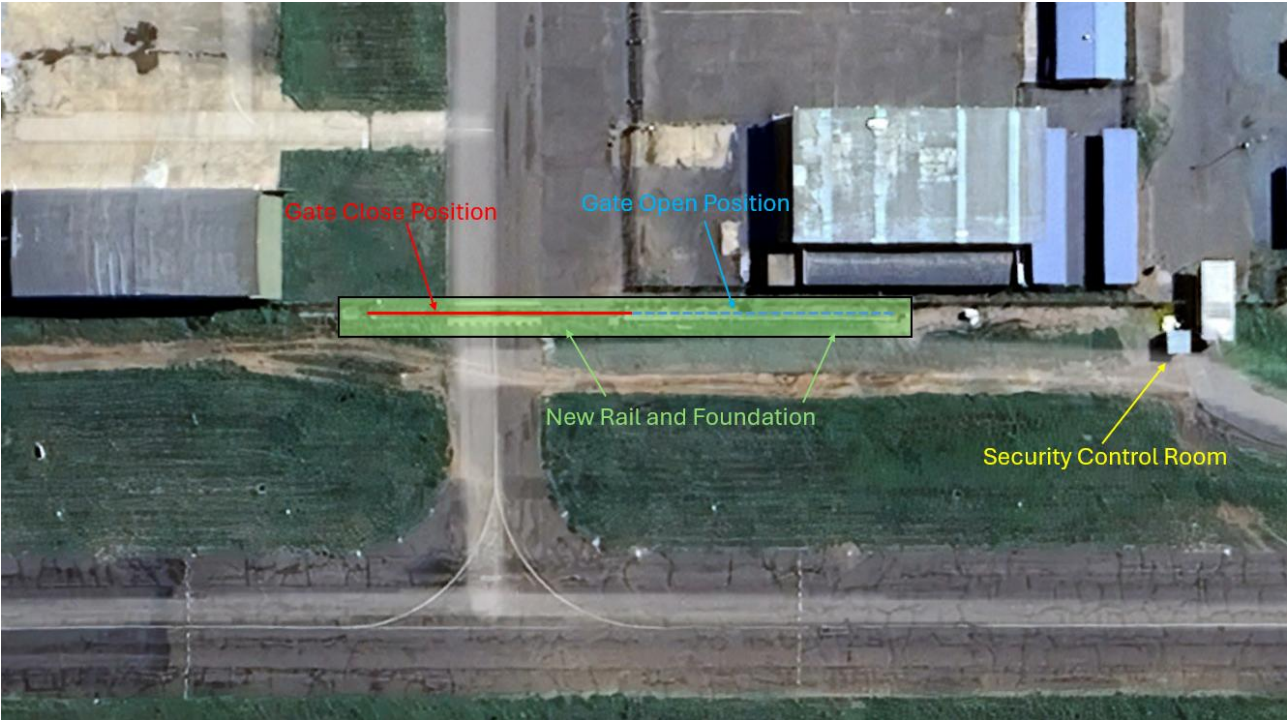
KIM Bravo Taxiway Gate Construction Site - Aerial View
